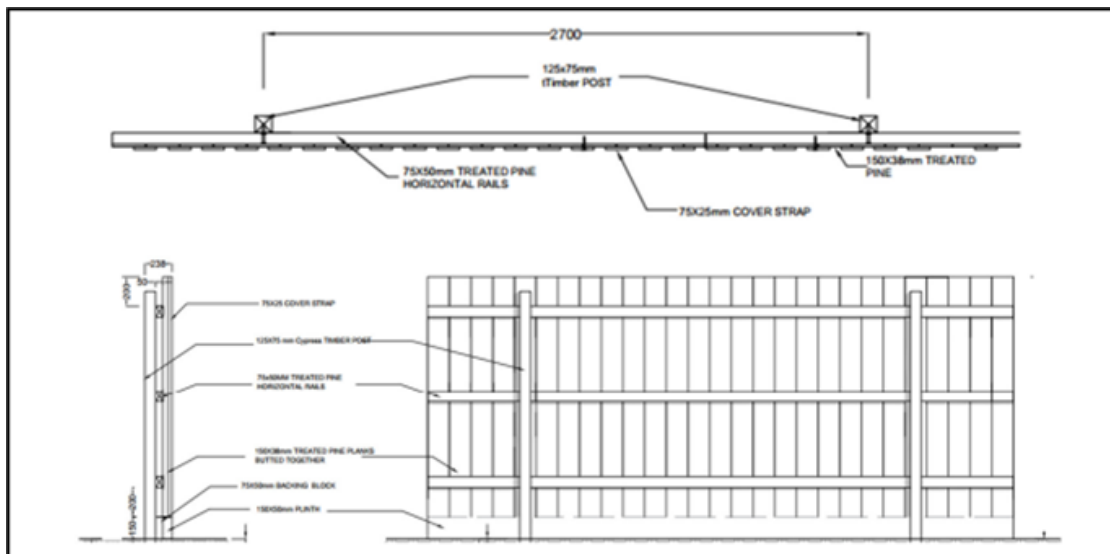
Acoustic barriers around the ground floor play areas (Source – Development Plans)
